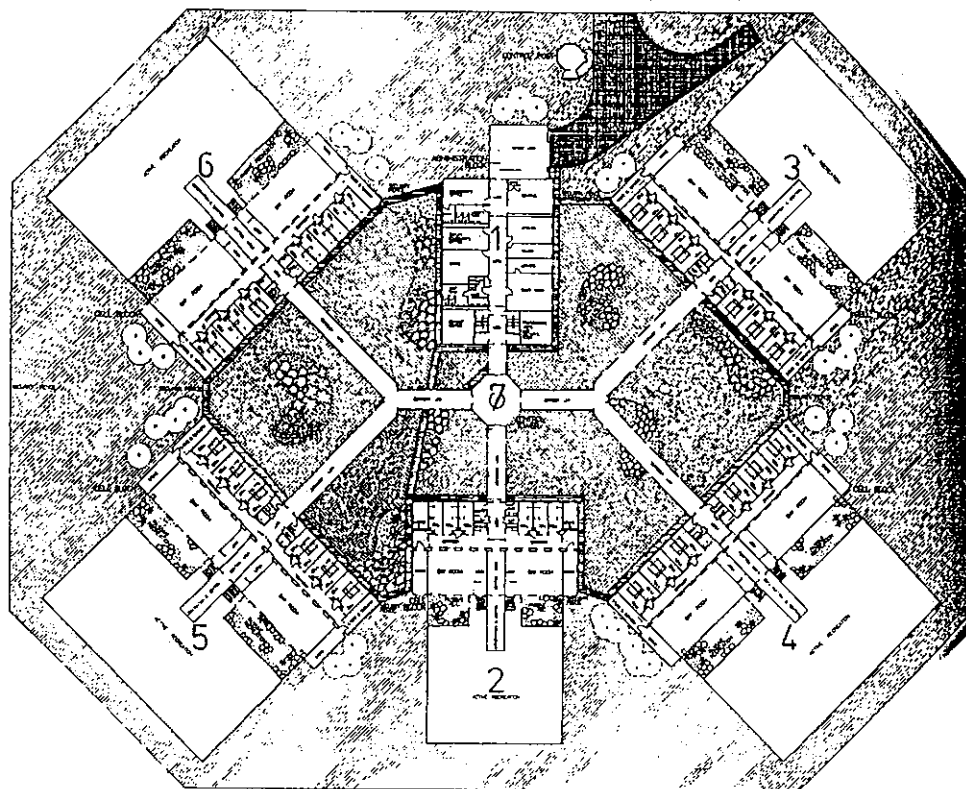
Plan, K Division. Reproduced from Out of Sight, Out of Mind.
